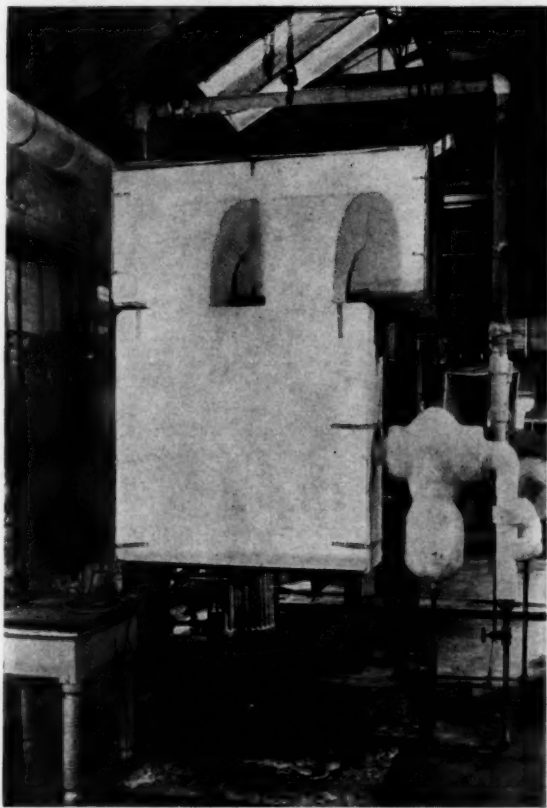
REAR VIEW OF UNIT HEATER AND MIXING CHAMBER
